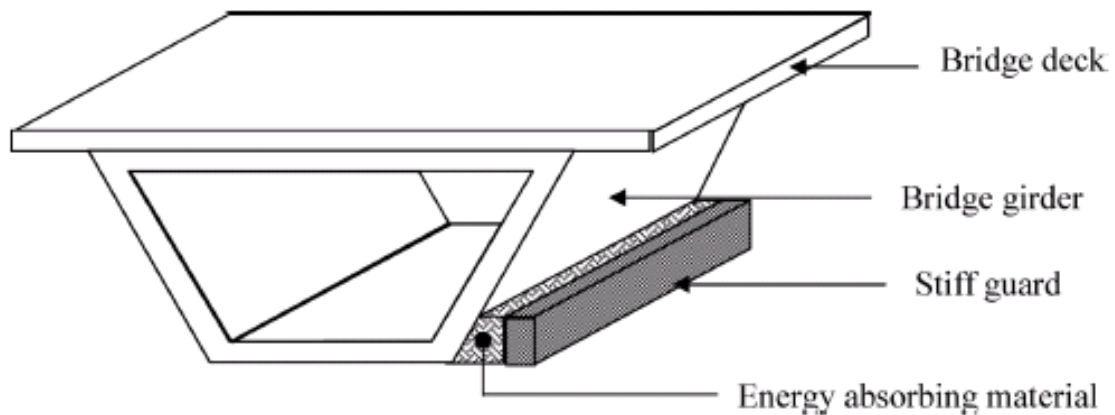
Sketch of proposed bumper for bridge girder (Sharma et al., 2008)
